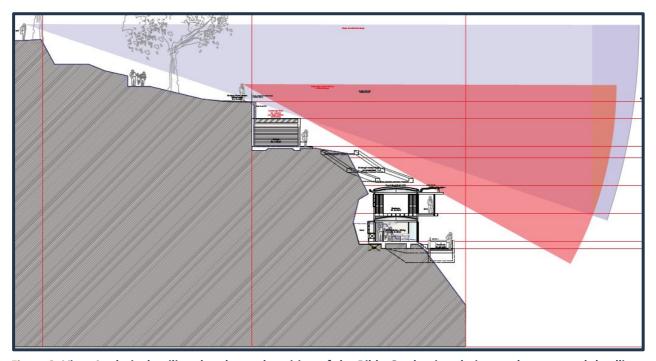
View Analysis detailing the elevated position of the Bible Garden in relation to the proposed dwelling (Source: Stephen Lesiuk Architect)
